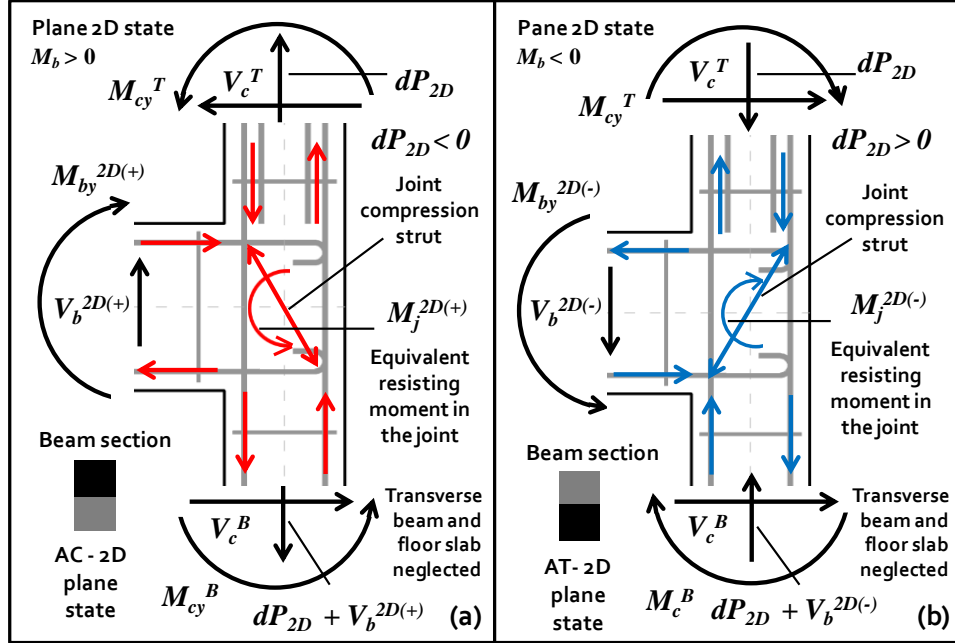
acting and resisting forces in a plane 2D beam column joint – slab and transverse beam neglected – symmetry in the beam bending capacity.
